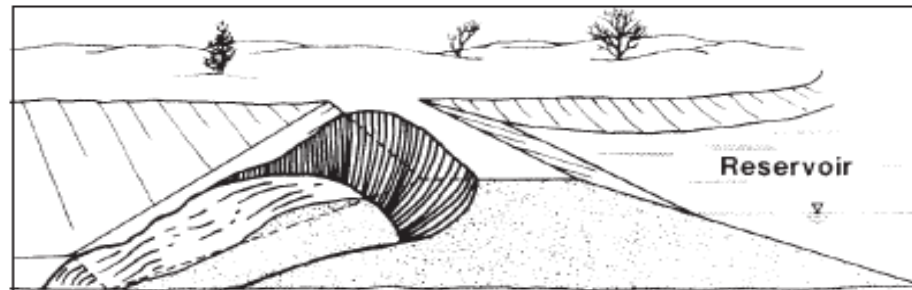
Development of a Slope Failure from Longitudinal Cracking
